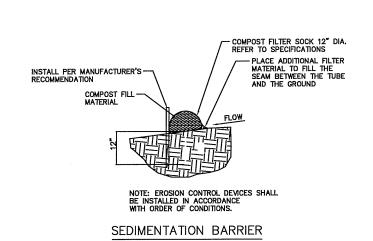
Northern Extra High Pressure Zone Improvements Plan and Profile Drawing Supporting Details and Specifications
